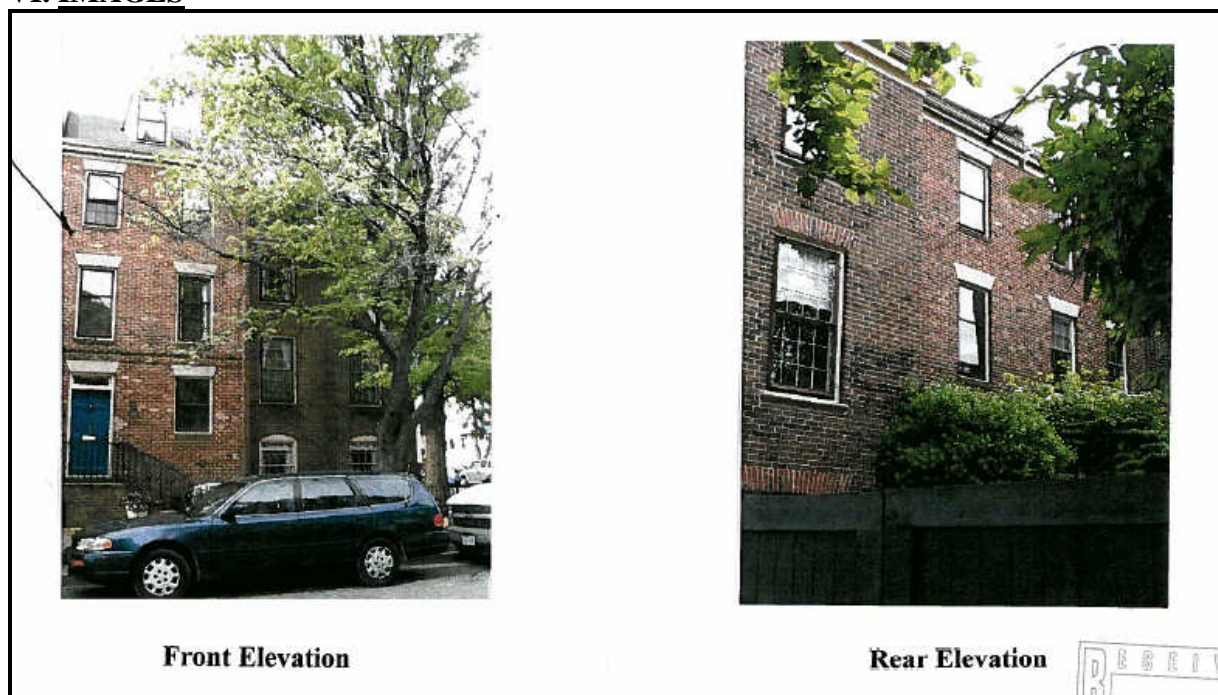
Photo of front and rear elevation of 216 Wilkes Street.
